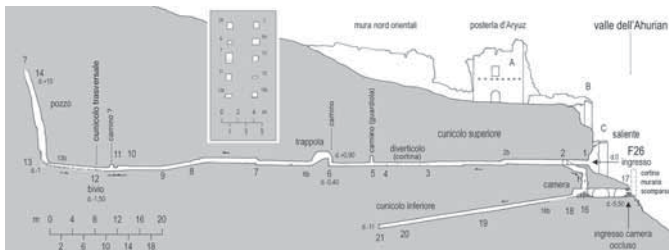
Ani, transversal and longitudinal sections of the tunnel Ghedan Ghyalmas (topography R. Bixio, V. Caloi, V. Castellani, M. Traverso; drawing R. Bixio).
